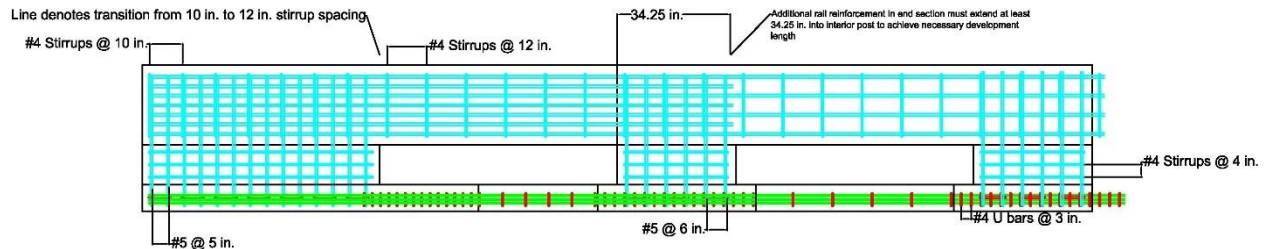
36-in. Open Concrete Bridge Rail End and Interior Section, Elevation View
